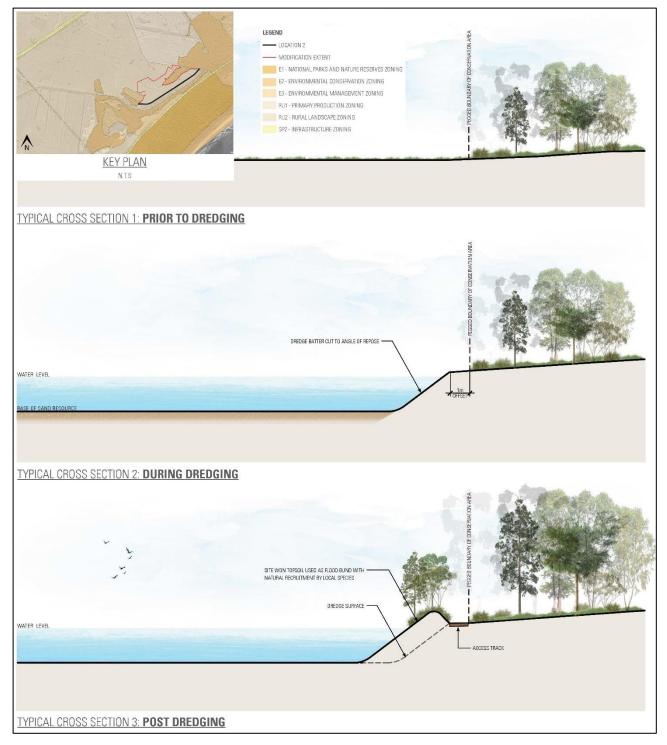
Typical Cross Section adjacent to Conservation Area 2C.1
